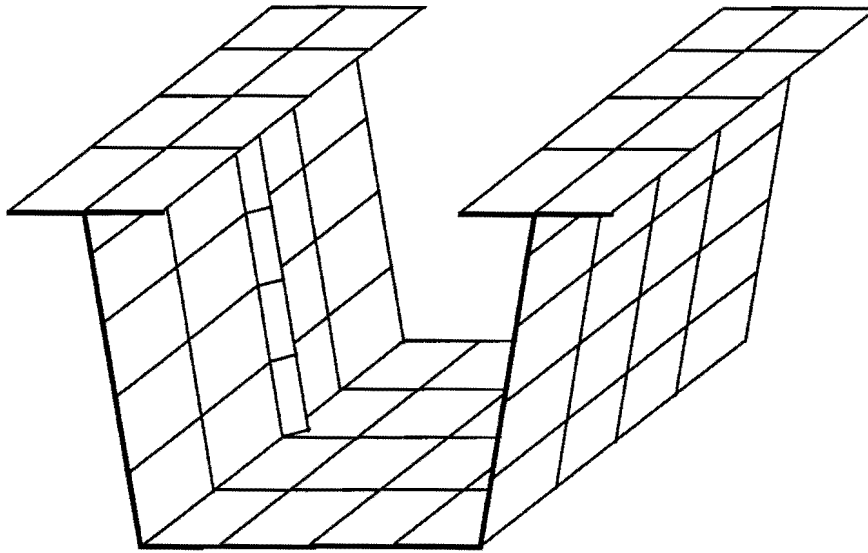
Typical FEA Mesh for Trapezoidal Quasi-Closed Box Girders
